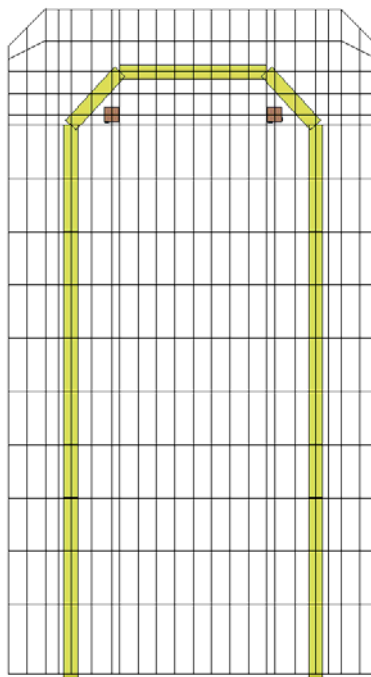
Original parapet mesh used for merging nodes with steel reinforcement.
